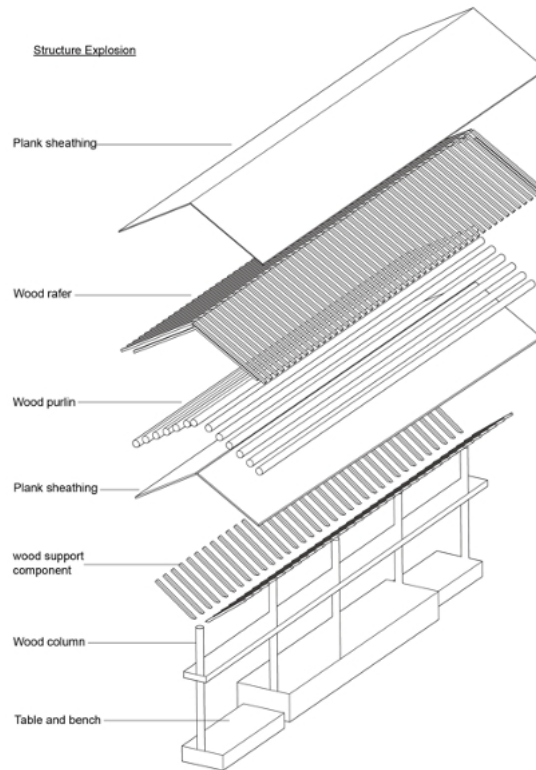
exploded analysis of corridor (Draw by Jia Haowen)
